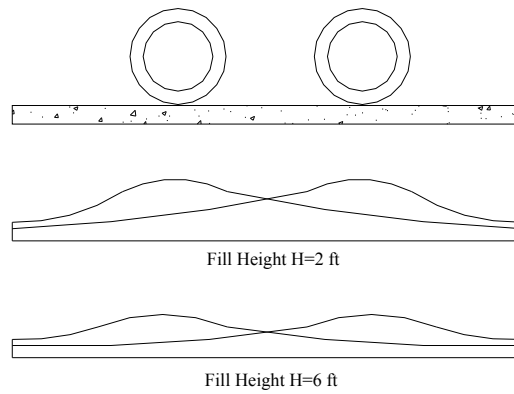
Aircraft Pressure Distribution for Rigid Pavement
